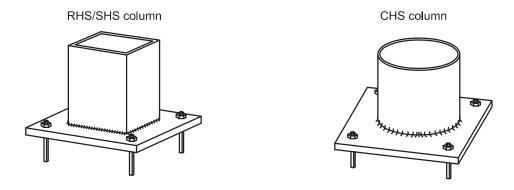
TYPICAL PINNED COLUMN BASE PLATES
